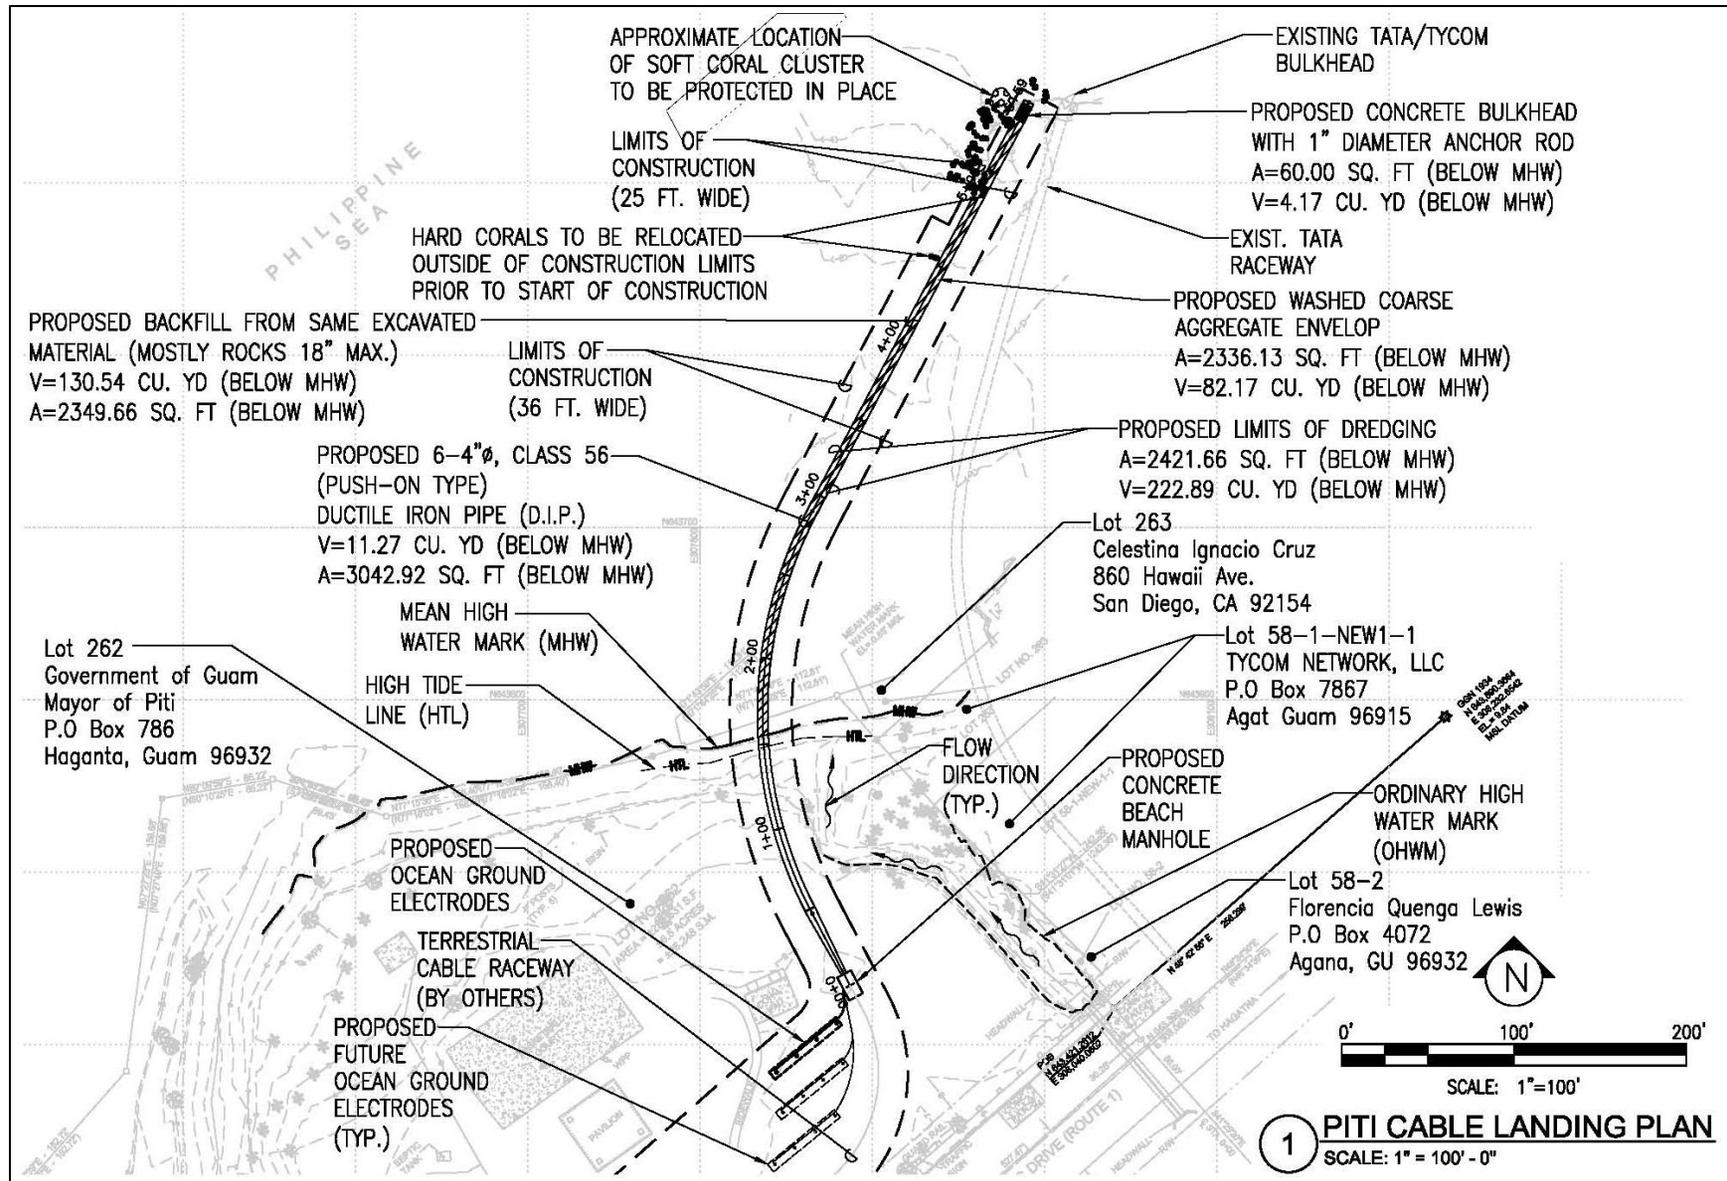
Cable raceway plan, Santos Park, Piti, Guam.
